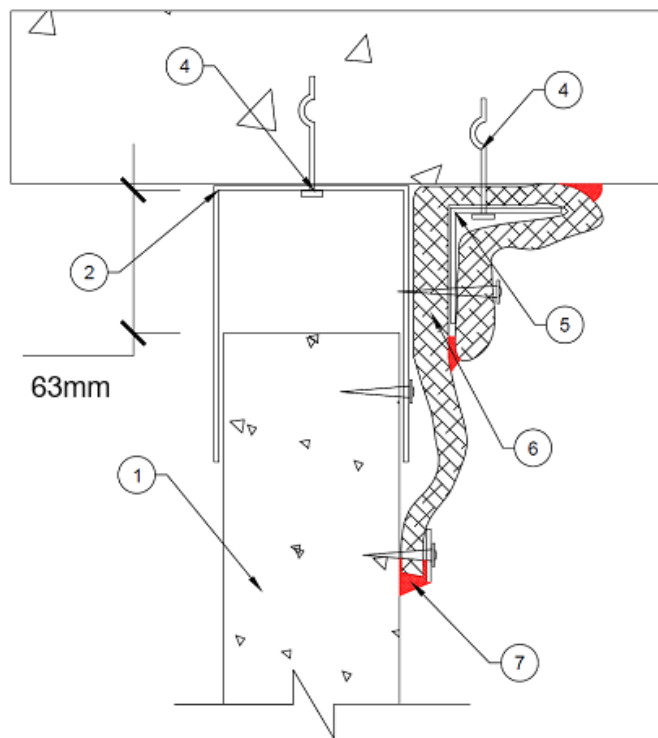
Head Detail 1 of the Wall with Maximum Gap Size
